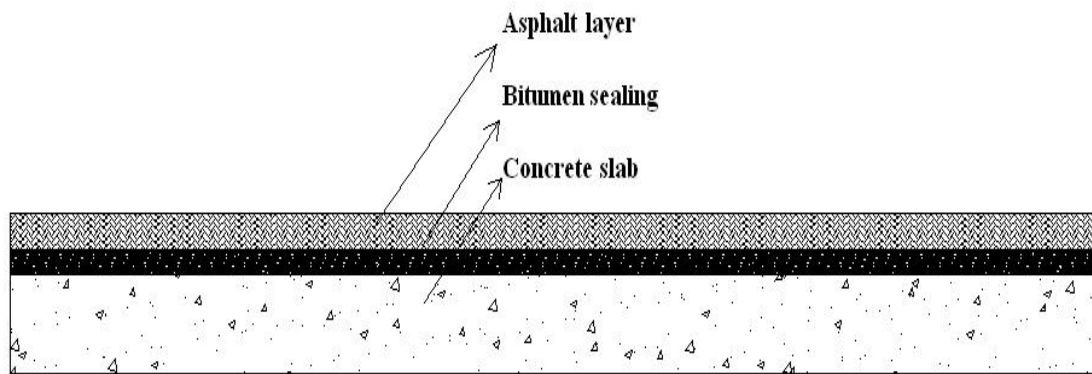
(a) Example of composition of a Bridge deck slab with sealing and pavement.
